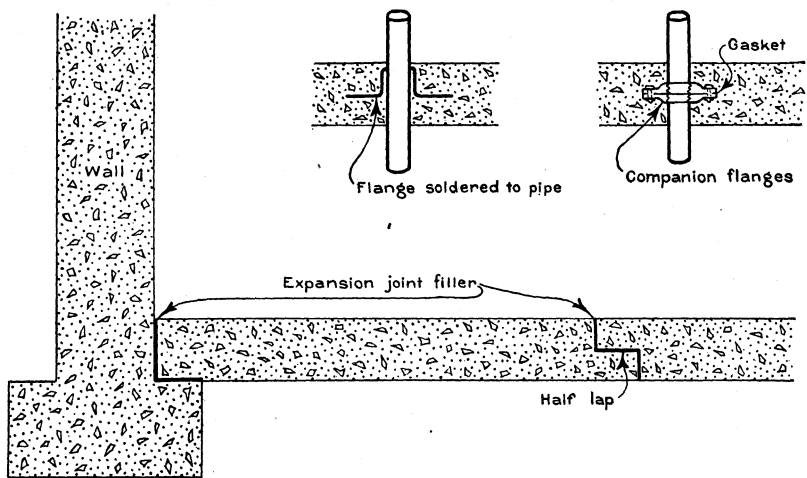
Water-tight construction: Floor laid with expansion joints and in alternate squares not exceeding 10 feet on a side; pipes through floor or wall provided with tight flanges of a diameter two or three times the external diameter of the pipe
